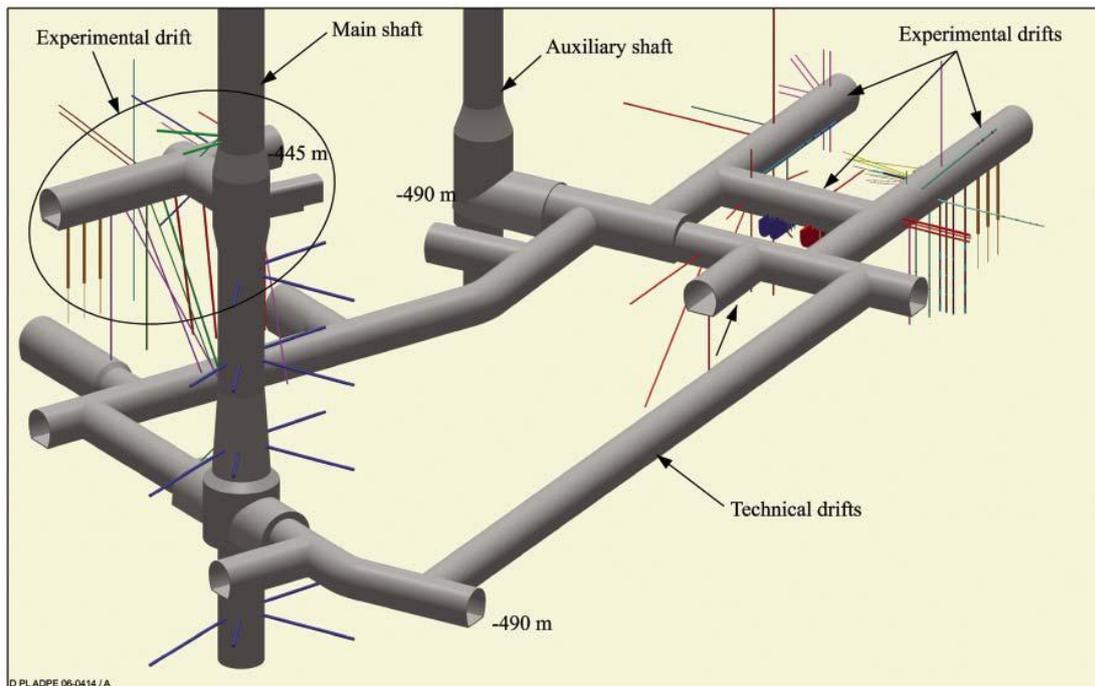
Layout plan of the Bure URL (Delay et al., 2011)
